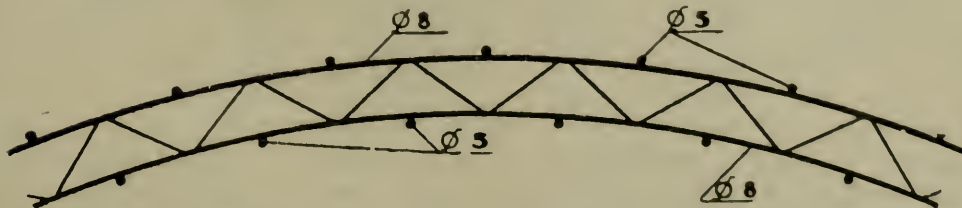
REINFORCEMENT FOR LIGHT CONCRETE ROOF.
